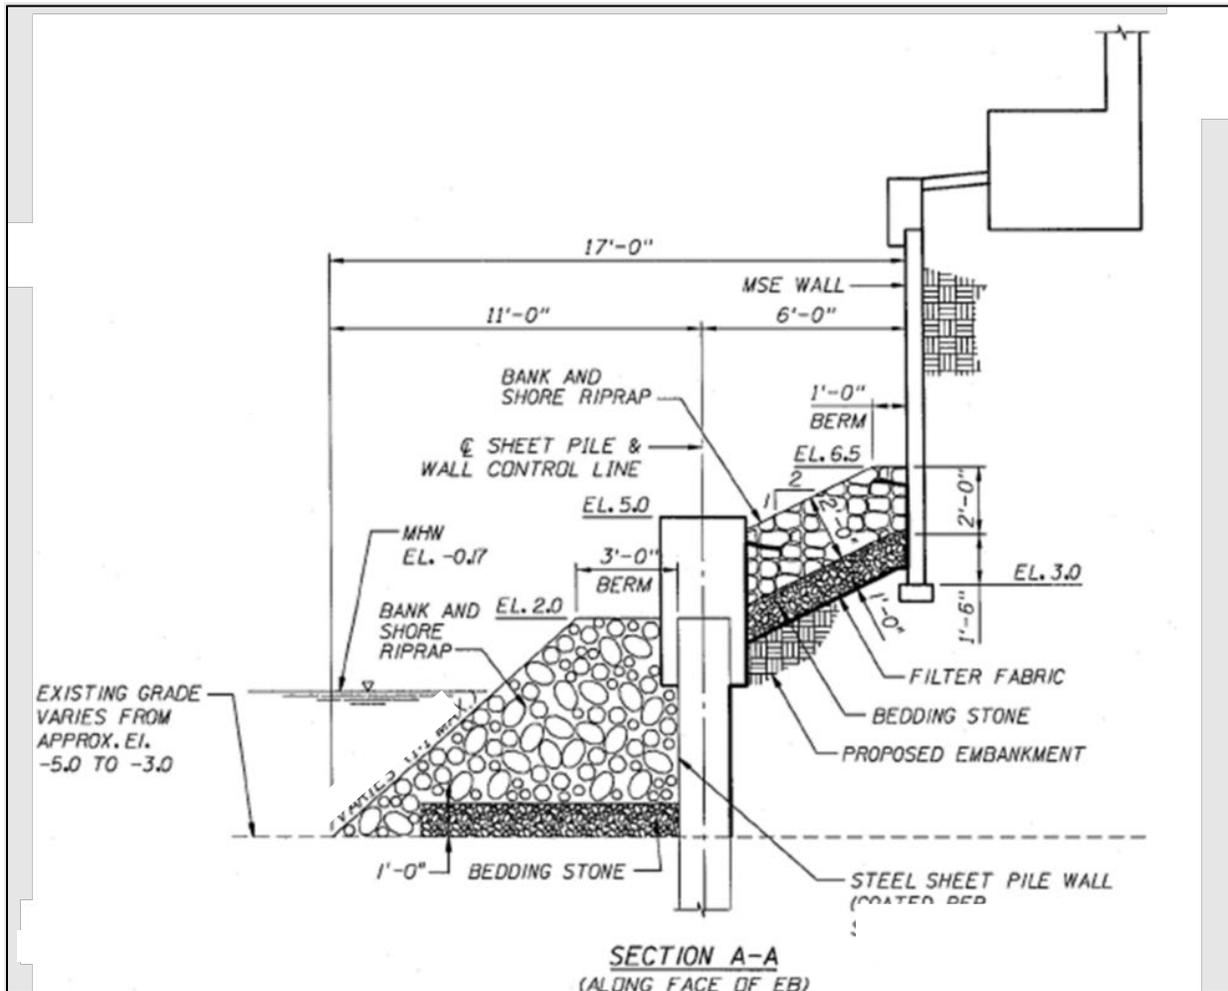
Example of Abutment Protection Design Including a Seawall
